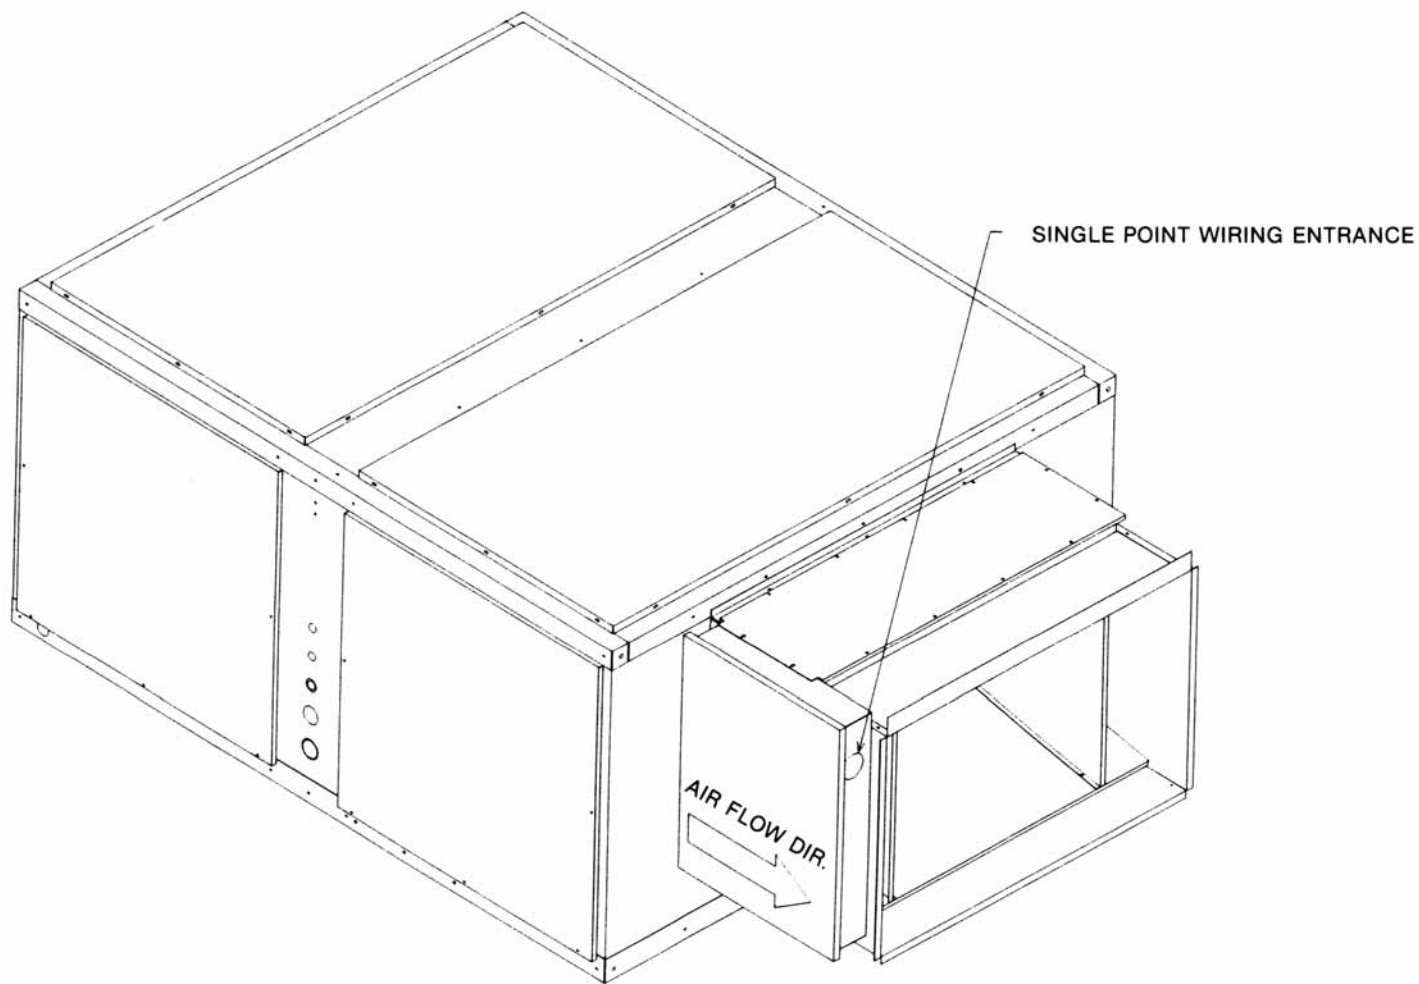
HEATER KIT INSTALLED TO AIR HANDLER
